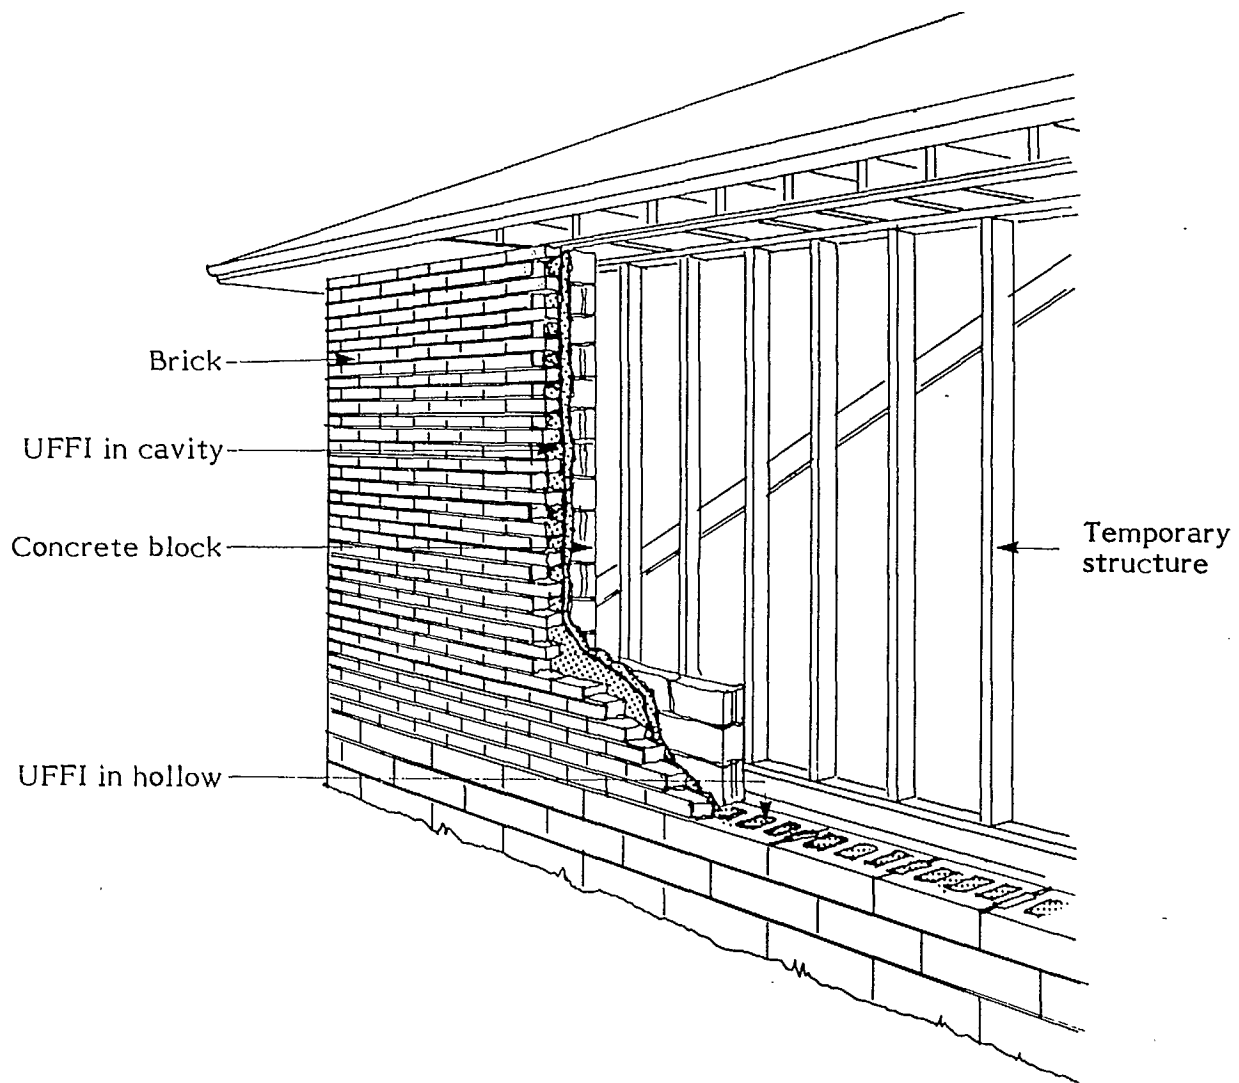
UFFI IN A BRICK/BLOCK WALL
